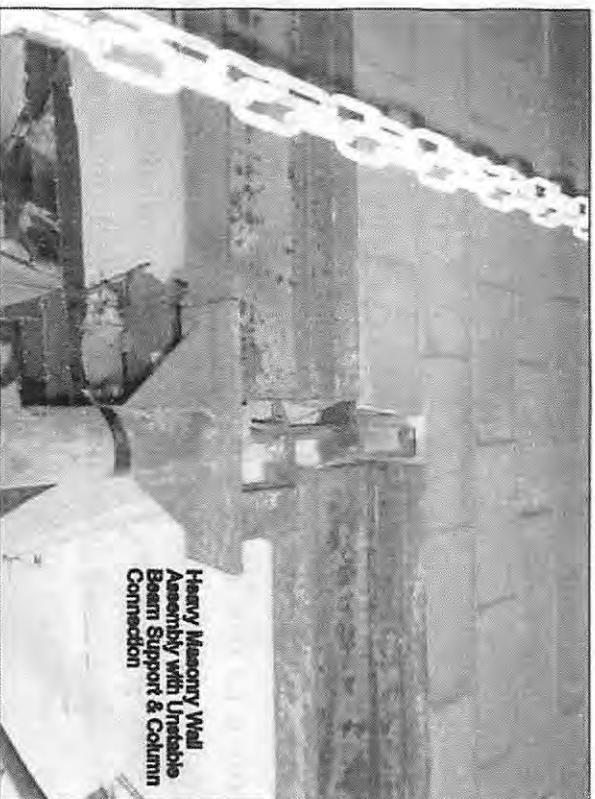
was taken on the Easterly side of the original building. There is a vertical fracture crack through the East wall as can be seen in the photograph. This was due to improper reinforcing within this wall section and improper reinforcing of a lintel over a former opening which is also depicted in this photo. We are bringing this to your attention because the entire fracture lies over an unsupported edge of this former
